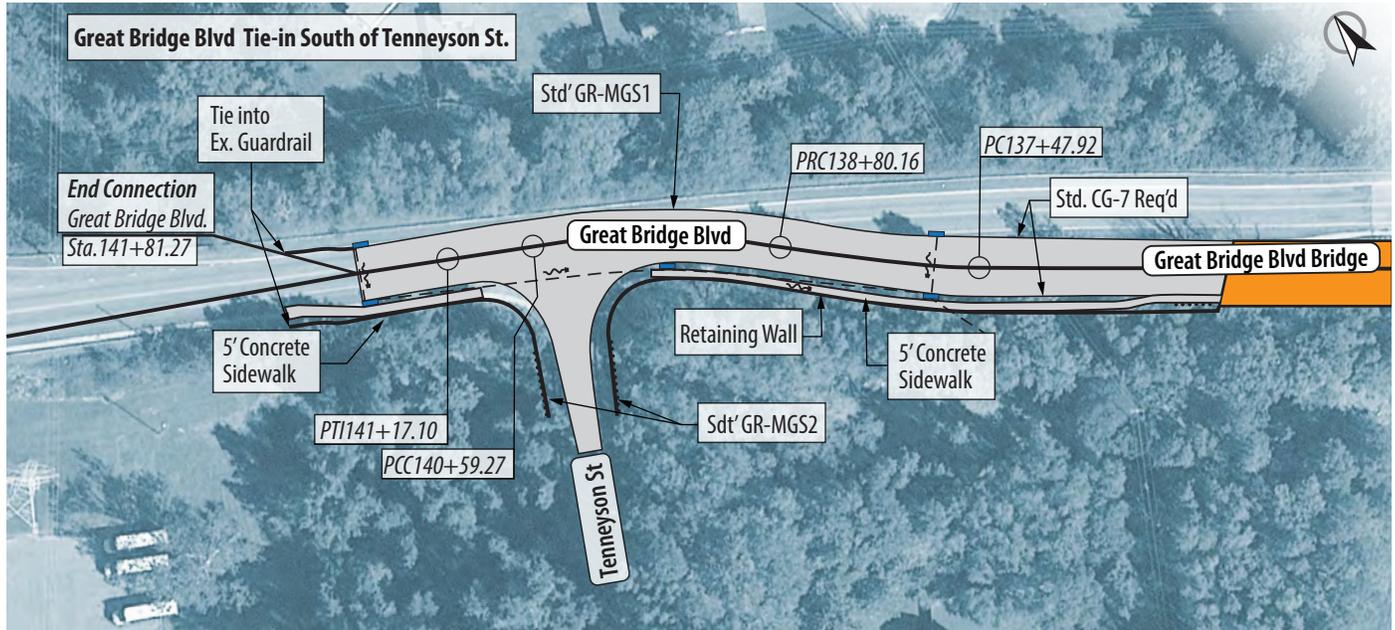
Roadway Realignment at GBB to avoid Stormwater Impact
